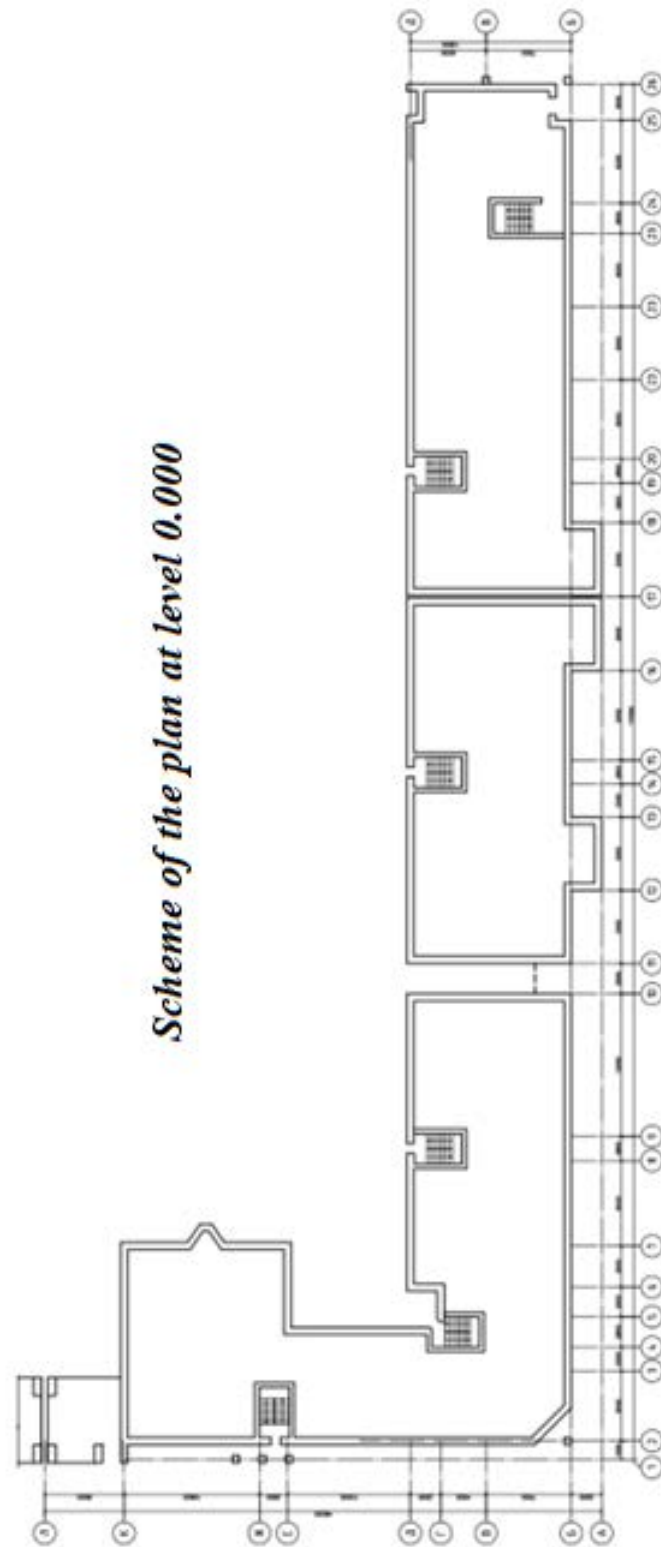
Sectional Apartment Building Floor Plan at Level 0.000
